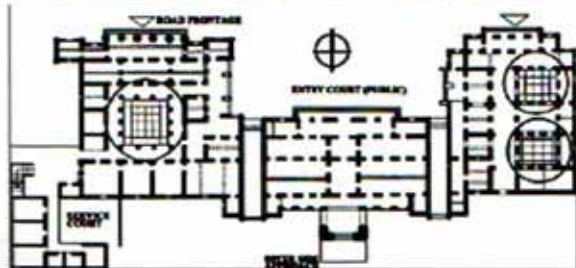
Ruplal Saha's House (Ground Floor Plan)
